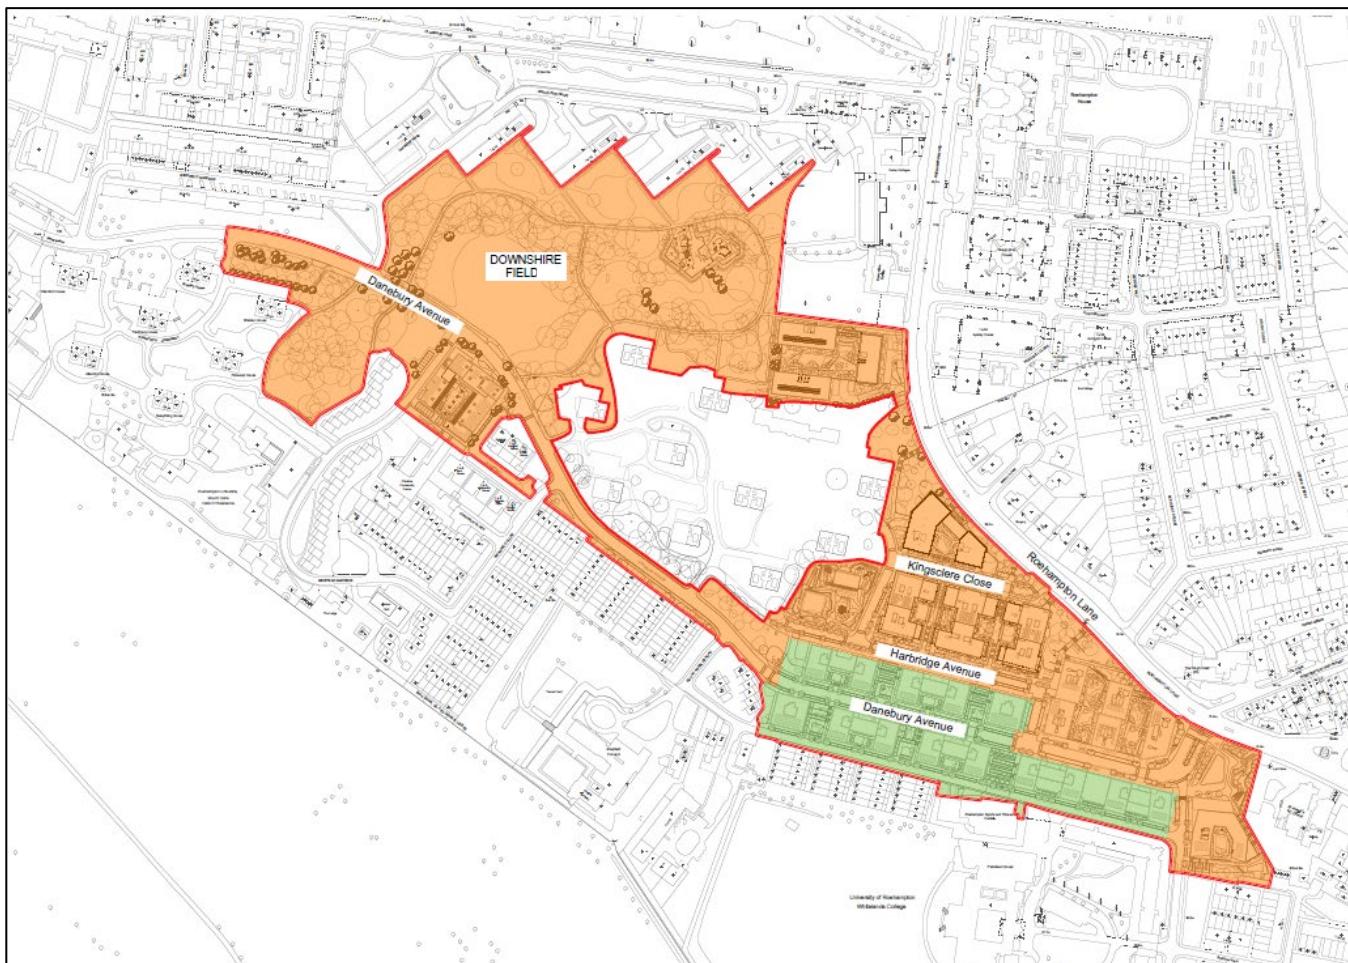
Site location plan (detailed site area in orange & outline site area in green).
